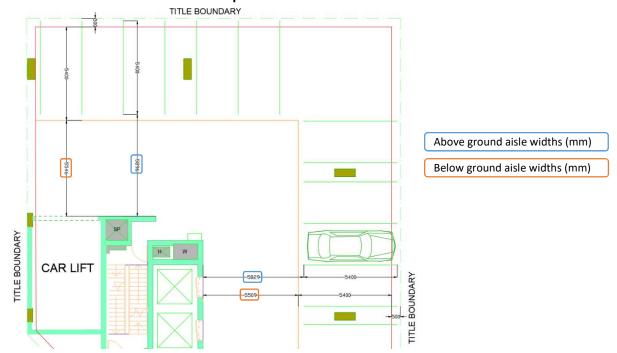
Existing parking floor layout in green and altered internal wall faces (red) and parking bay extents (orange) to accommodate minimum foundation requirements in underground parking levels.
